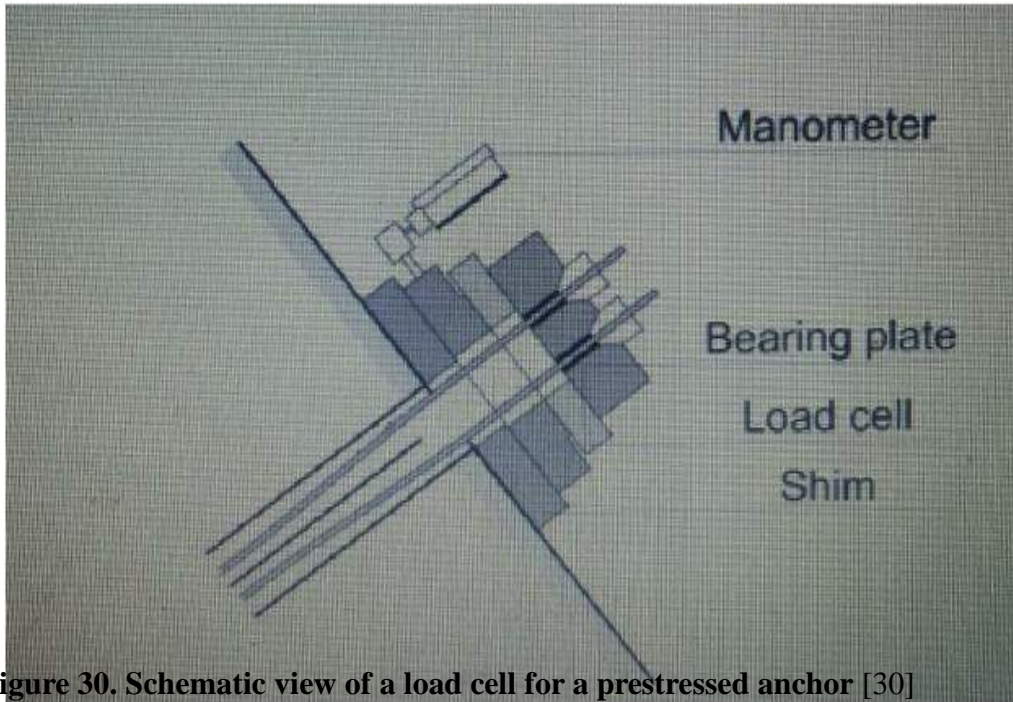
Schematic view of a load cell for a prestressed anchor [30]
